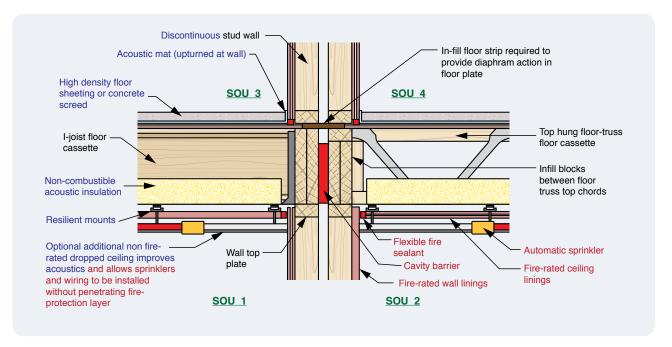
Floor/ceiling and wall connection illustrating fire, acoustic and structural elements.
